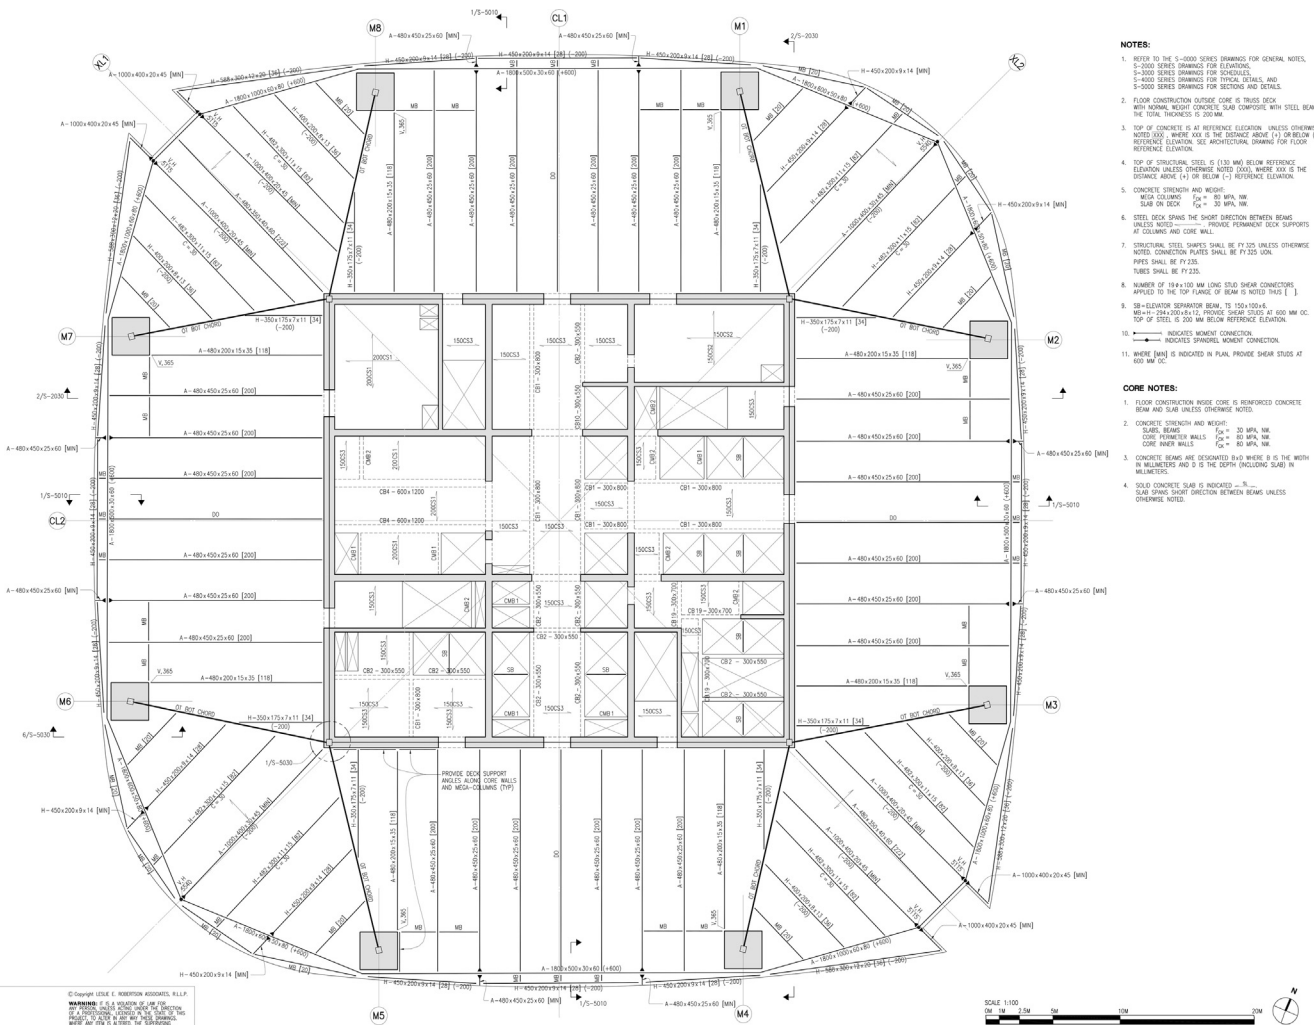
Structural system and dimension of outrigger + core + mega column in a key plan.
